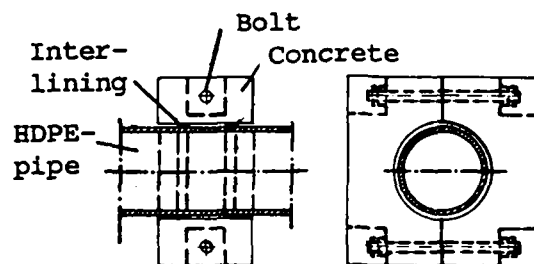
Concrete weight used for loading. Mounted before submersion.
